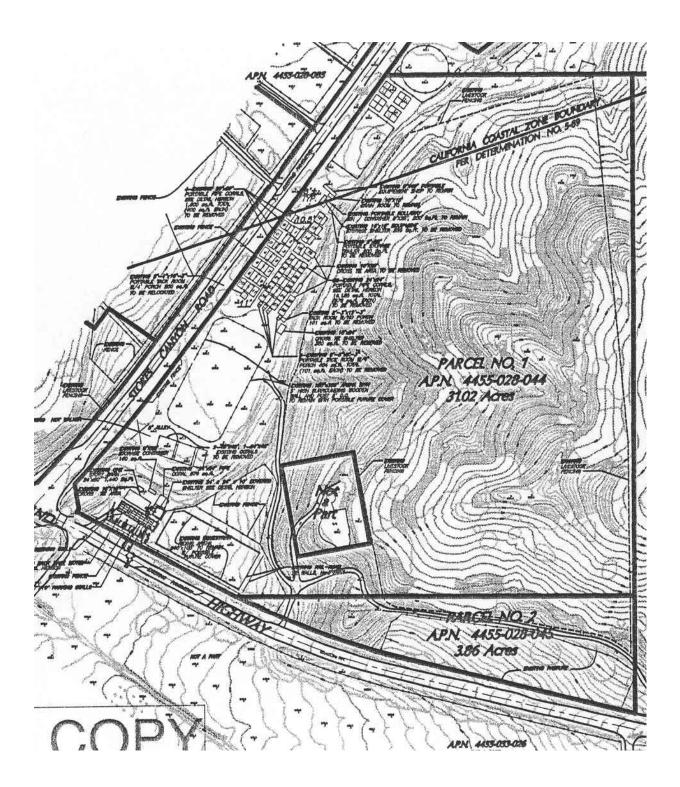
CDPA No. 4-02-131 Site Plan (Existing)
